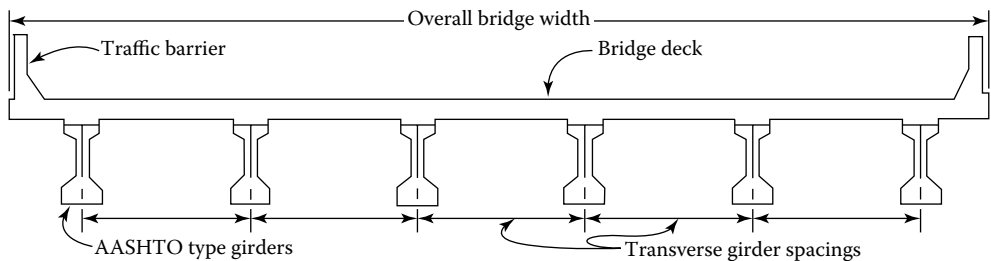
Typical cross section of slab-precast, prestressed concrete superstructure.
